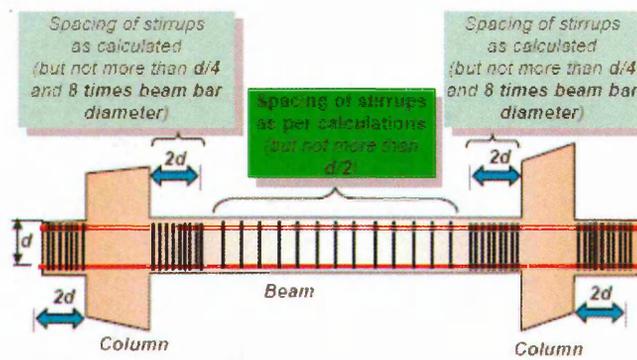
Location and amount of vertical stirrups in beams-limit on maximum spacing ensures good earthquake behaviour (IITK-BMTPC, 2003)
